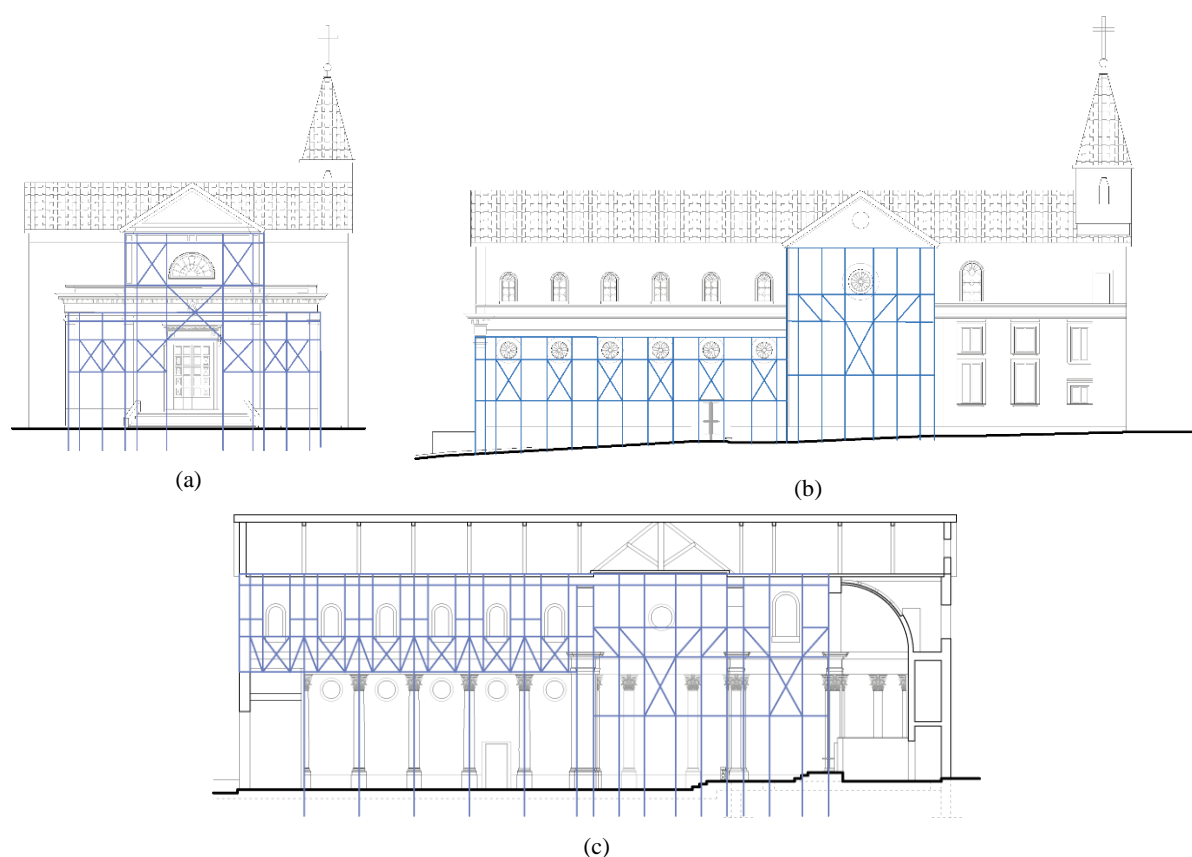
Layouts of the iron frames of the system: front façade (a), lateral façade (b), upper wall of the central nave (c)
